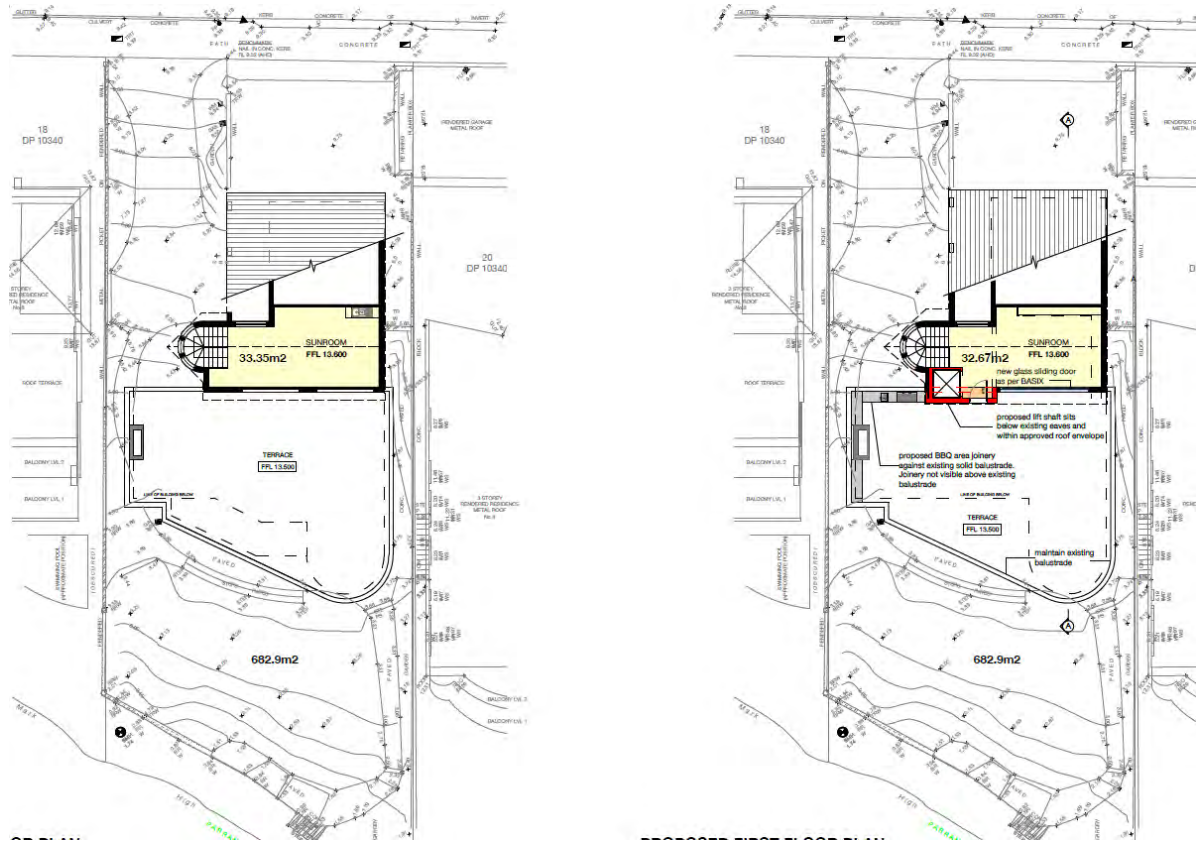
Proposed first floor plan with existing plan on the left and proposed plan on the right.
